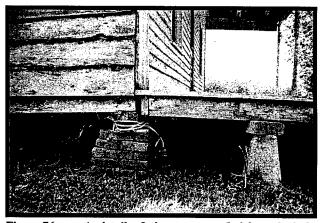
A detail of the masonry (brick and cinder block) piers at Standing Structure 55-1113.
